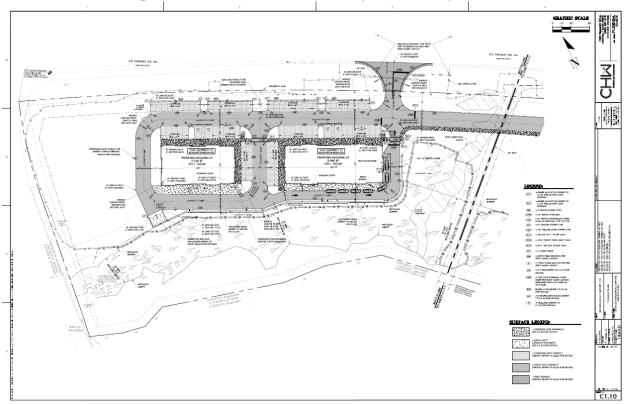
Proposed Site Plan for Golf Plaza (Sheet 2 of 2)
